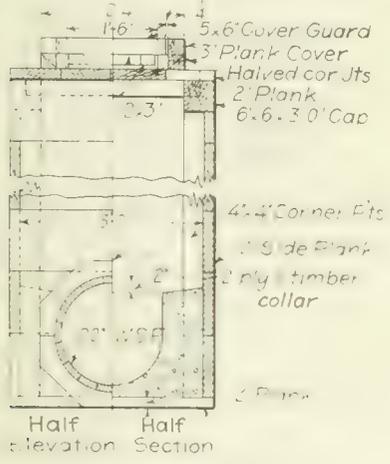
Details of Standard Timber Manhole, Panama-Pacific International Exposition Sewerage System.
